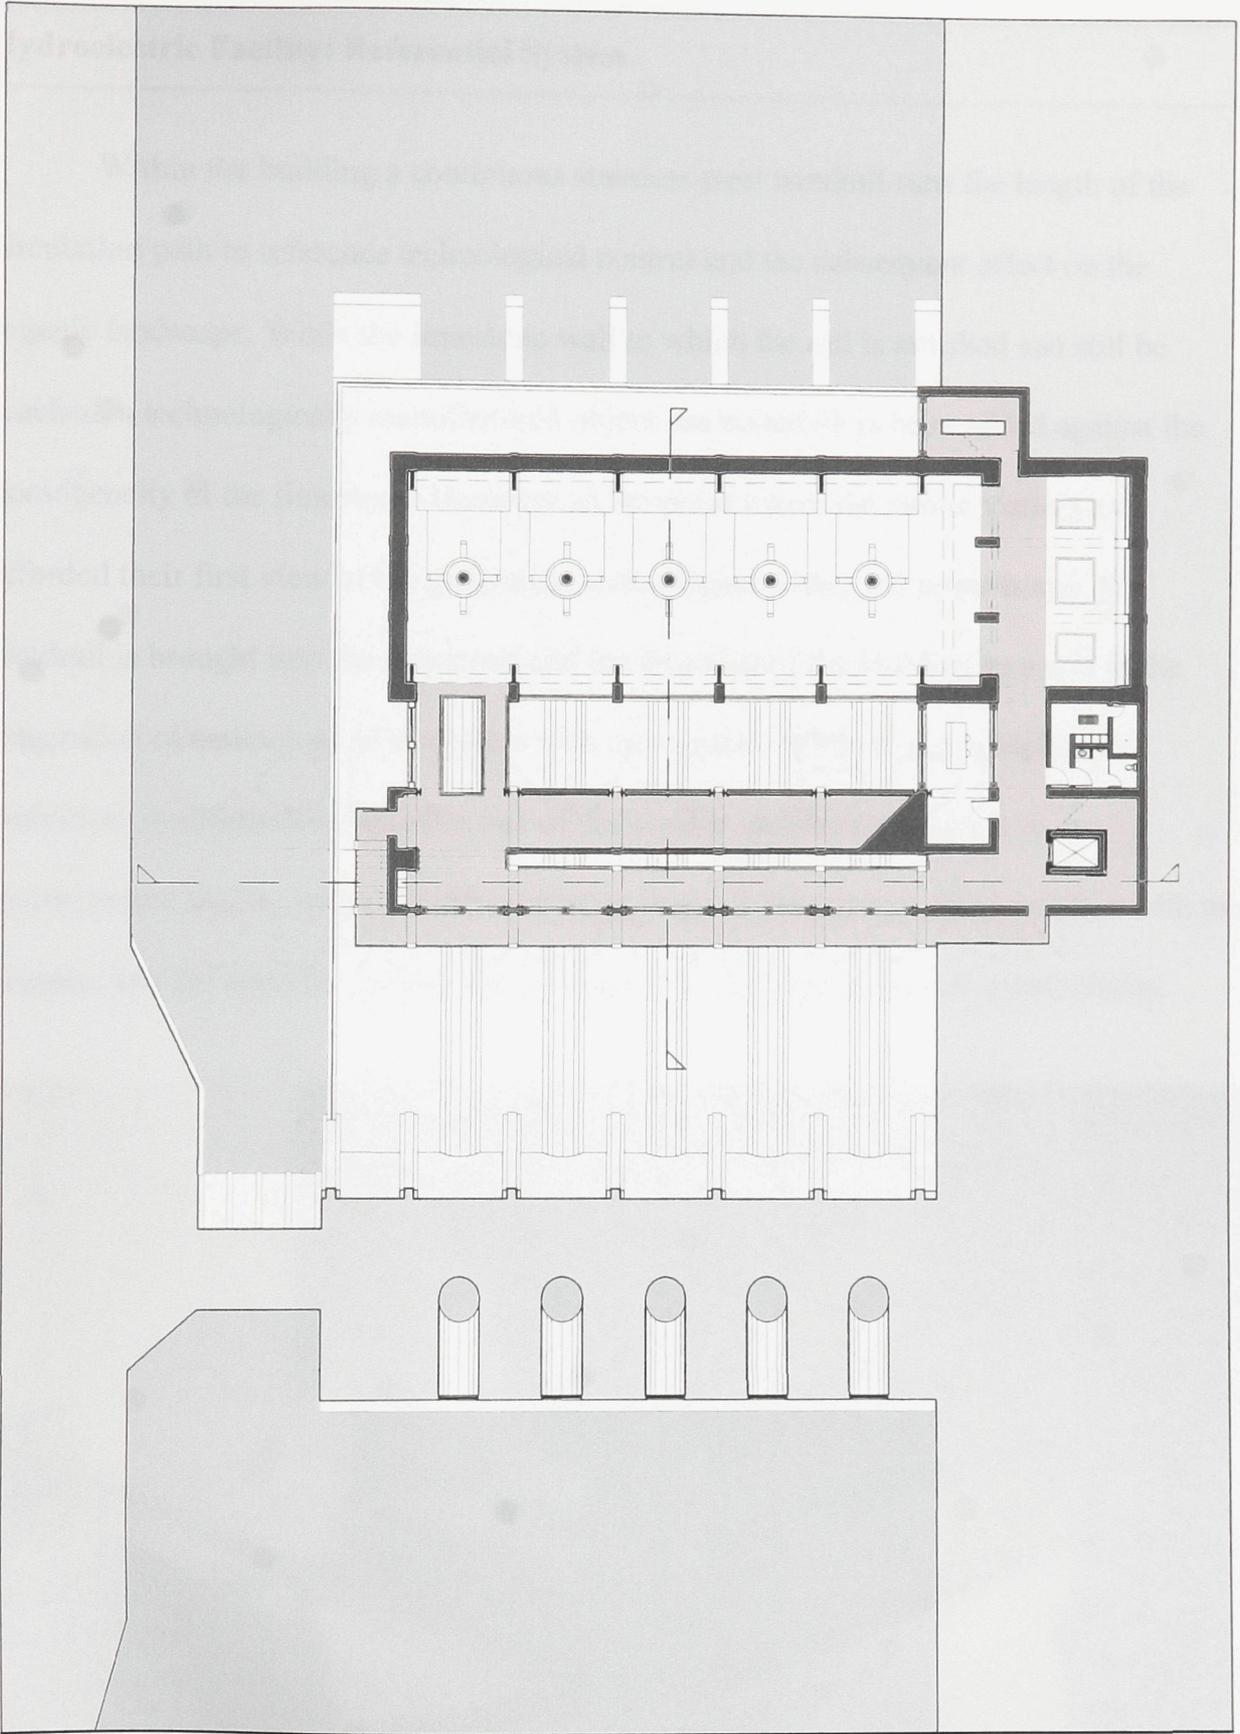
Technological Space: Ground Floor Plan, AutoCad drawing @ 1:400, 2005. Created by author.
